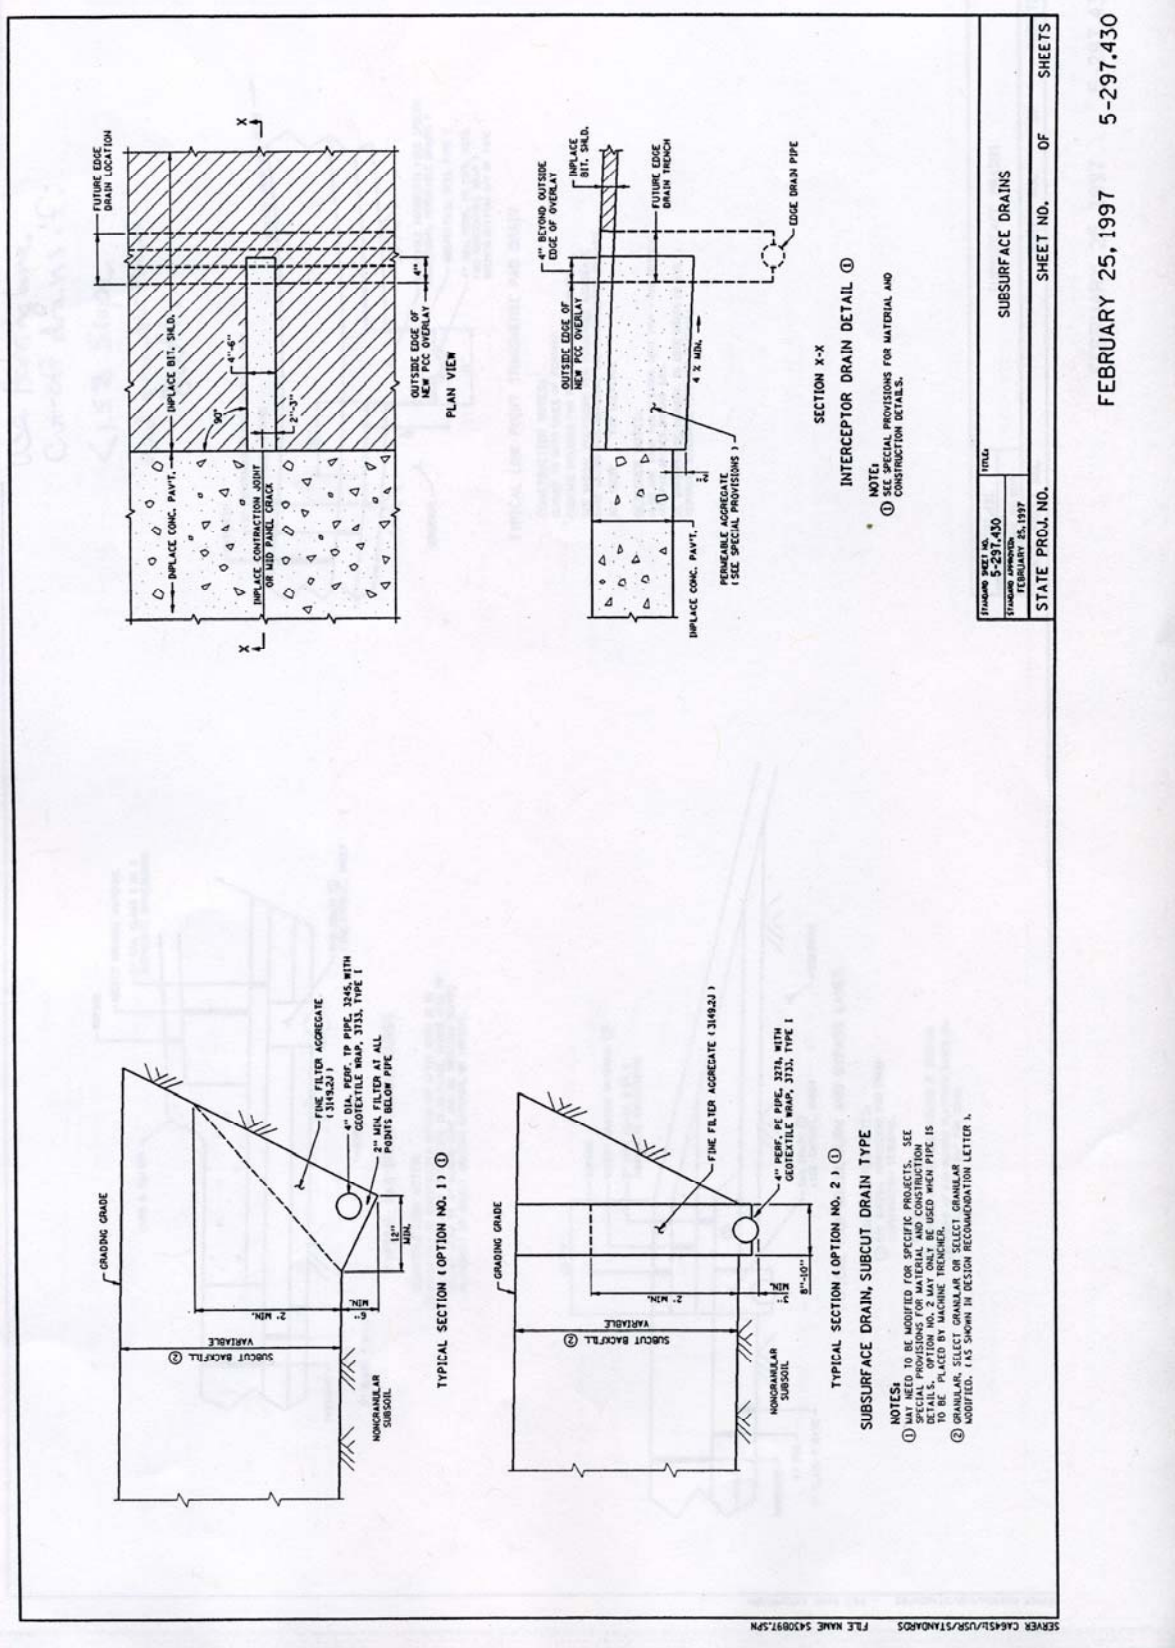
Cross-section of a typical subcut drain type (Mn/DOT, 1994b).
